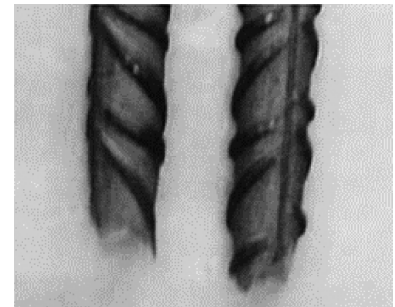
Fracture of the specimen N° 1 in static tensile test
